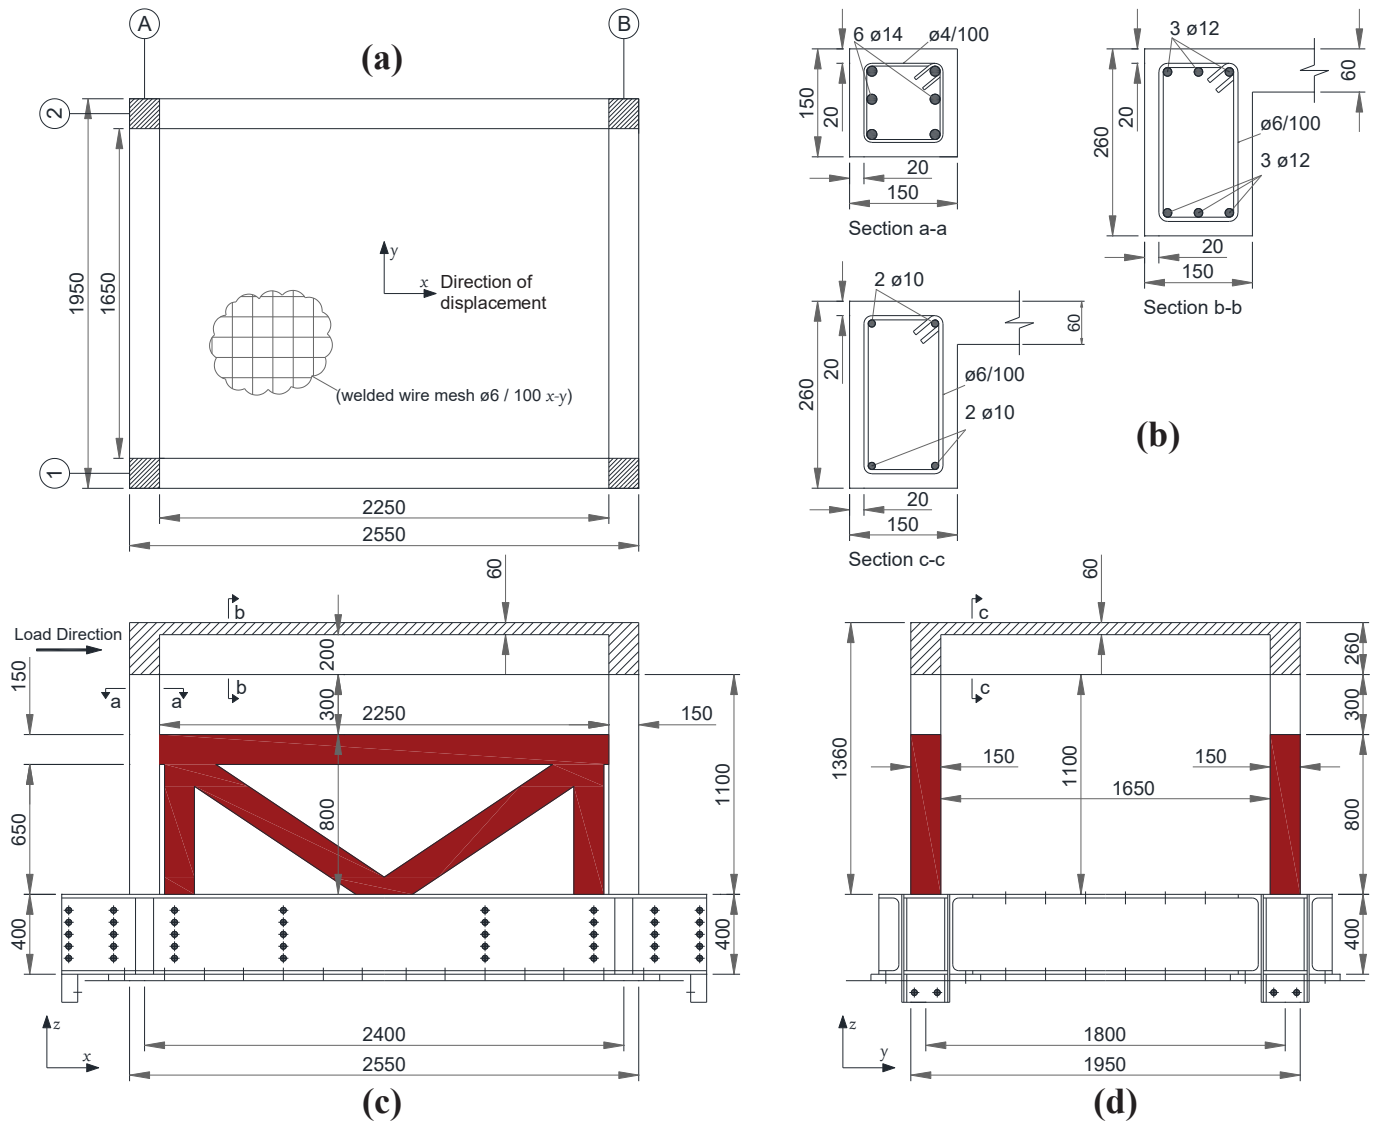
Geometry and details of tested building (a) plan view, (b) cross sections of elements, (c) elevation showing loading direction and braced steel frames, and (d) elevation in transverse direction.
